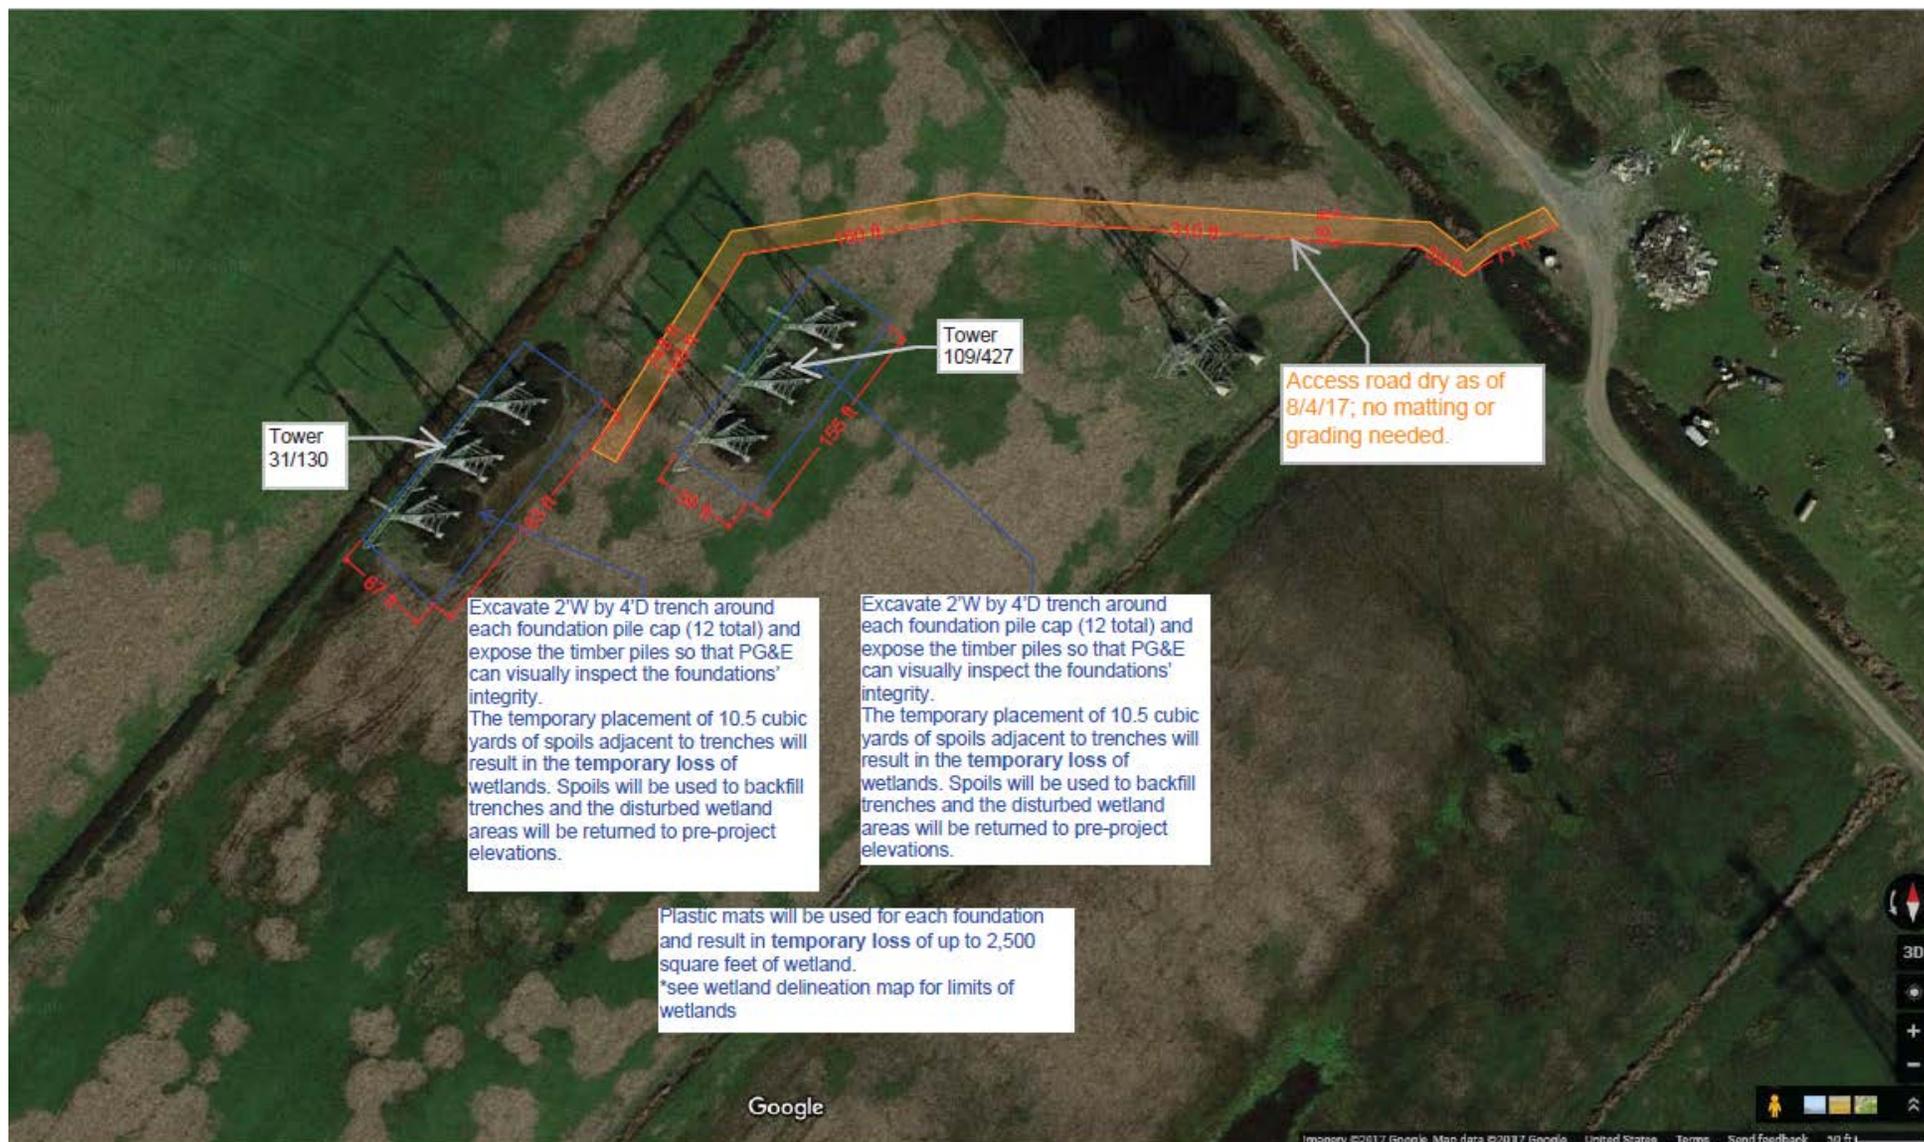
Footing Inspection Area - Towers 31/130 and 109/427
